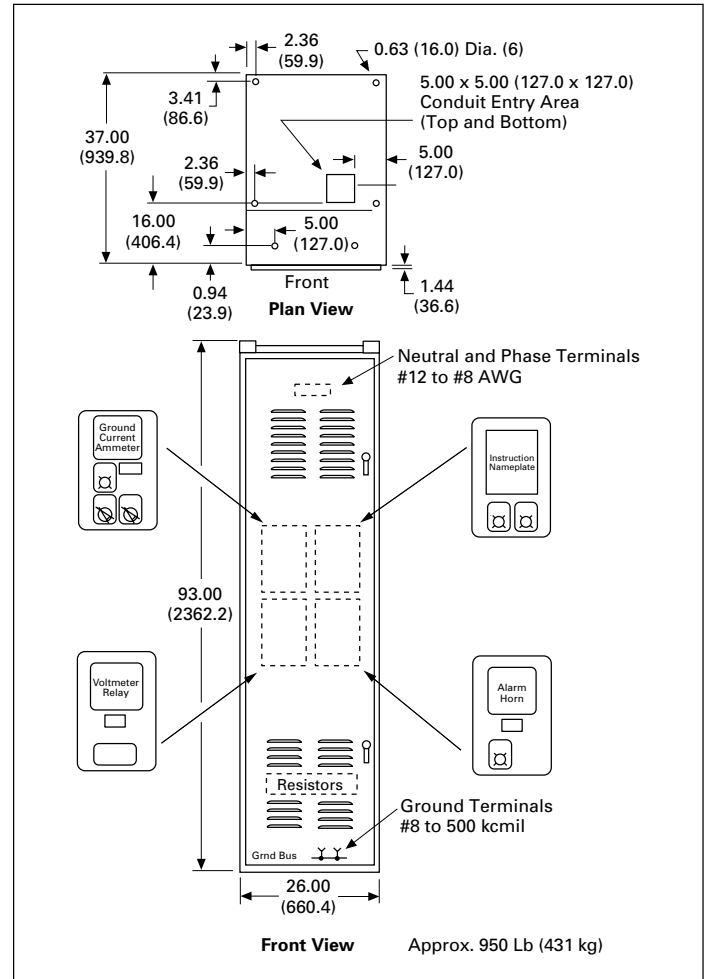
NEMA 3R Outdoor—Dimensions in Inches (mm)
